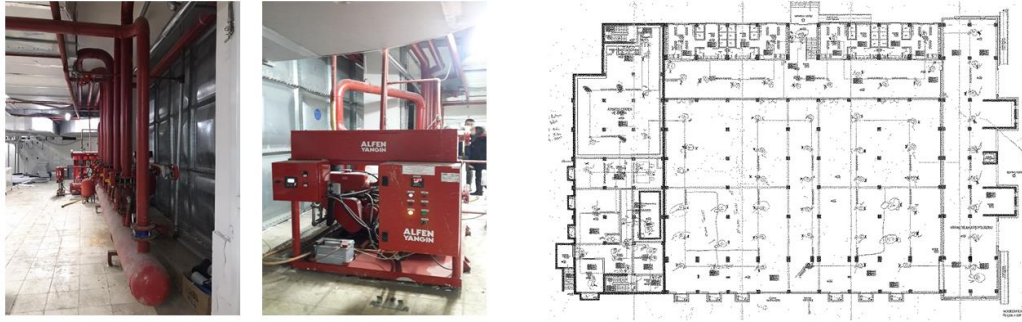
Fire extinguishing system and detection plan (Source: İremnur Öztürk et al., 2020)
